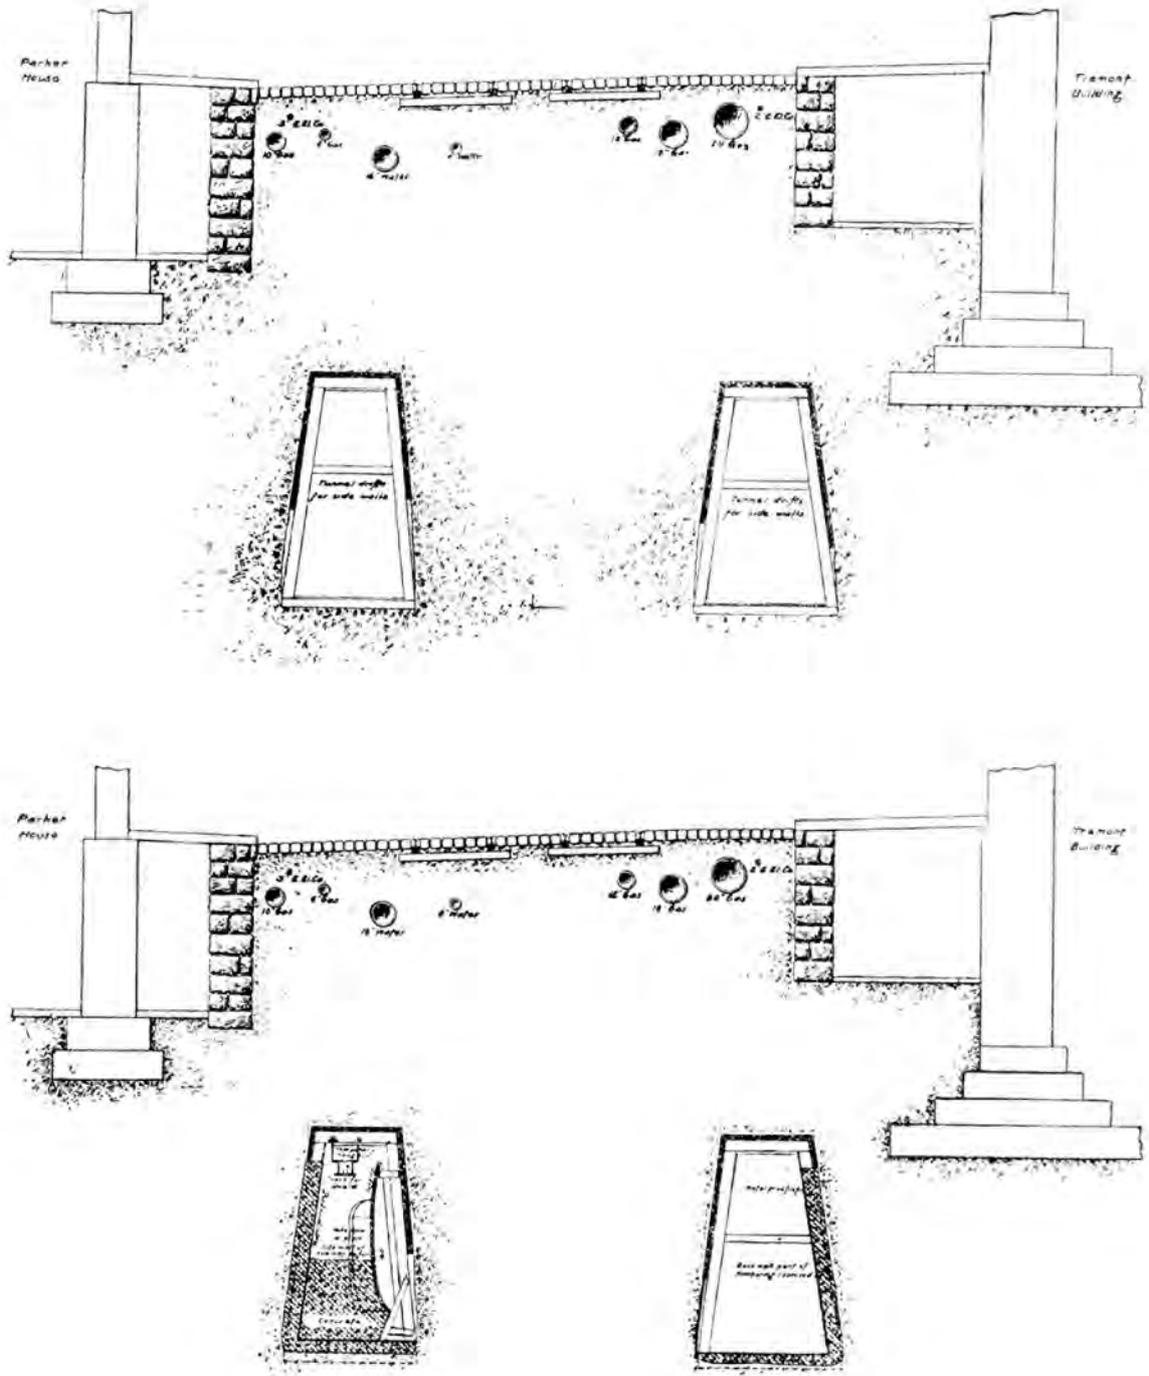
UNDERGROUND RAILWAY, BOSTON, U.S.A.
